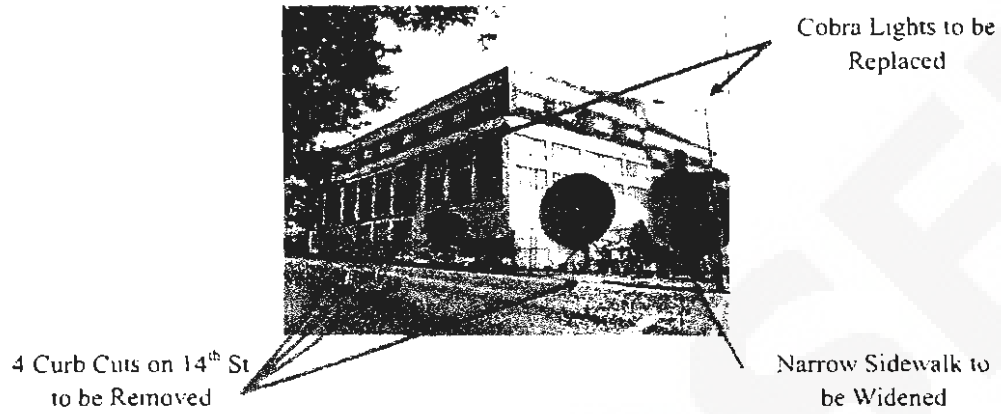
Corner of 14<sup>th</sup> Street and Florida Ave., NW
